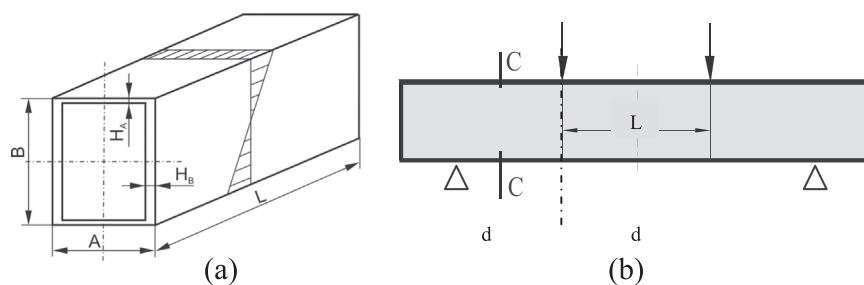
Box-section girder under pure bending: (a) dimensions; (b) load and support layout.
